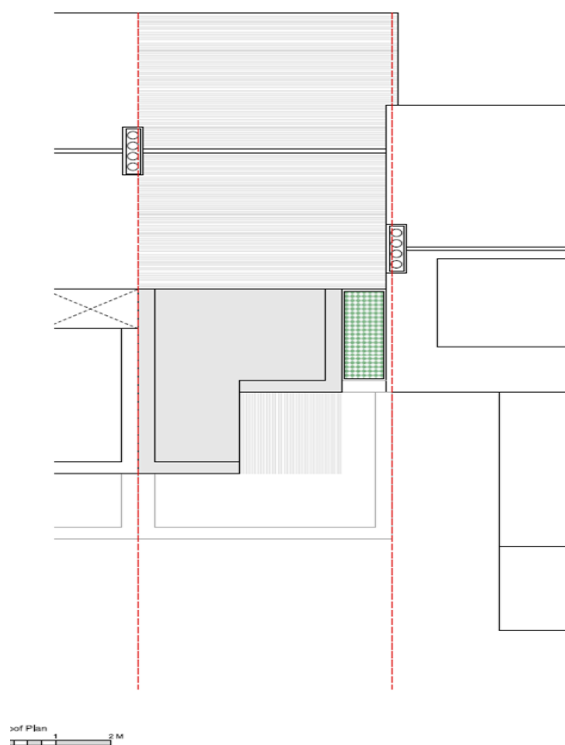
Showing proposed roof plan of refused application ref.no.260060
